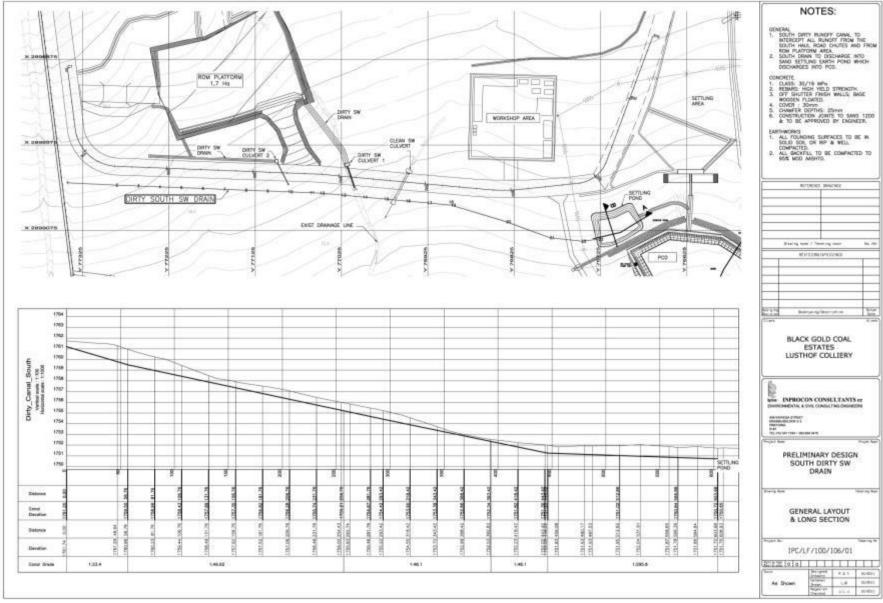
(a): South Dirty Surface Water Drain and Settling Pond - General Layout.
